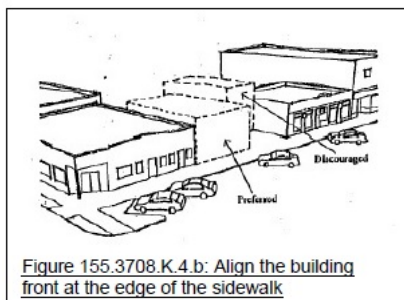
K.4.b: Align the building front at the edge of the sidewalk
